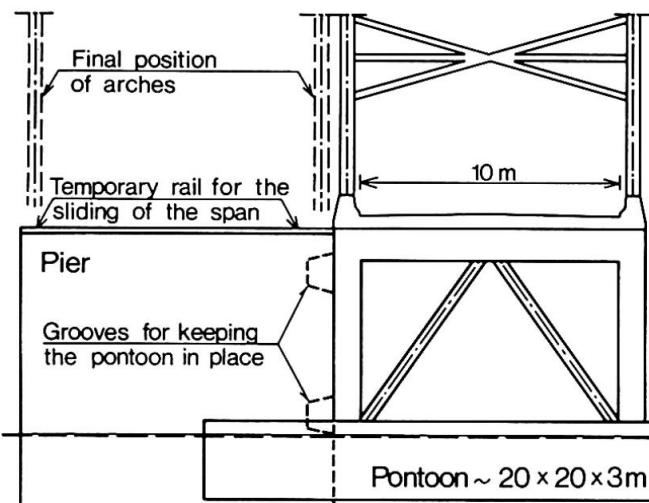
Pontoon and pier with the span on the pontoon ready for transfer.
